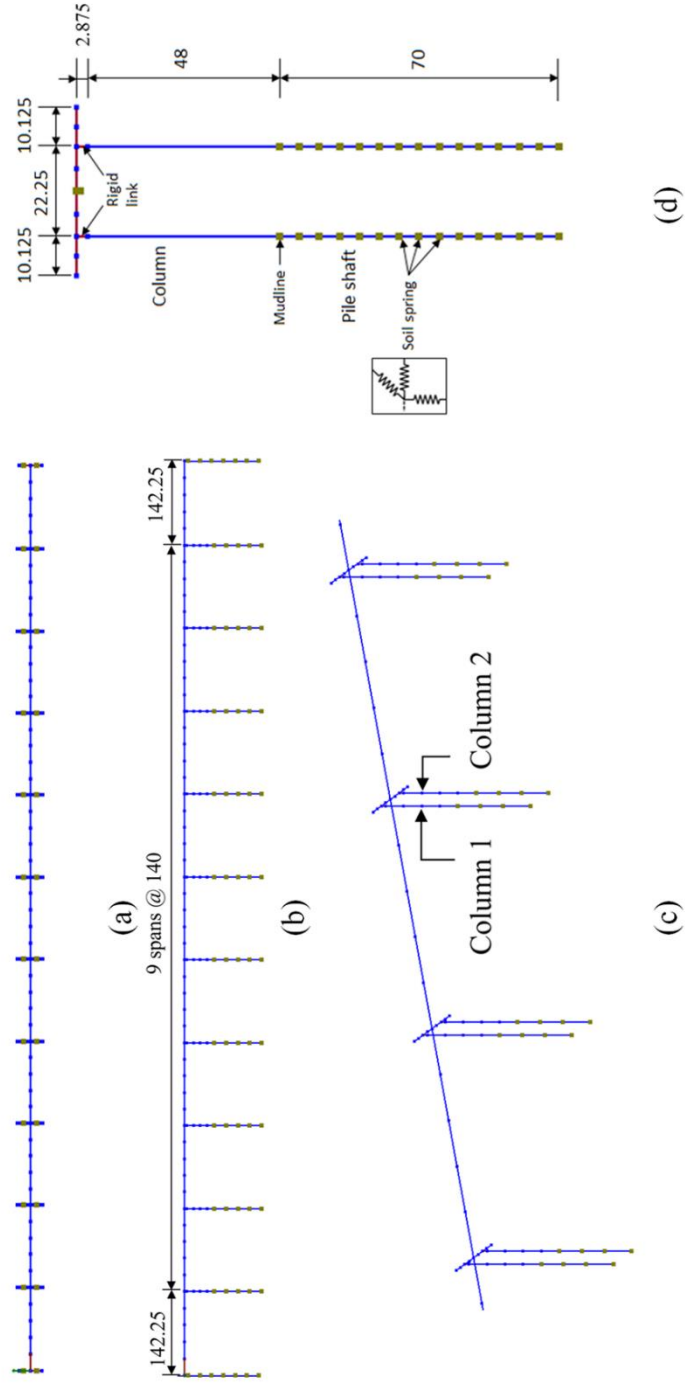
Bridge FE model created in MSBridge (dimensions shown in ft): (a) plan view; (b) elevation view; (c) close-up of 3D view; (d) side view of a bent (typical)
